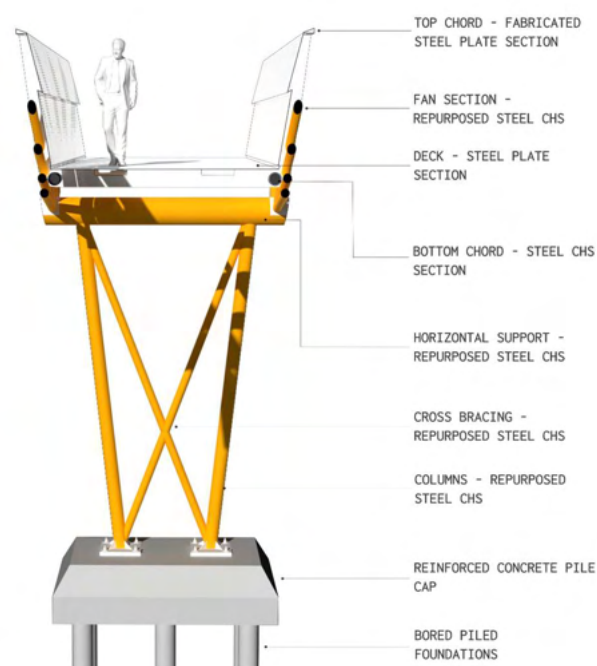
Tan House Section - Repurposed Steel - @FormatEngineers
